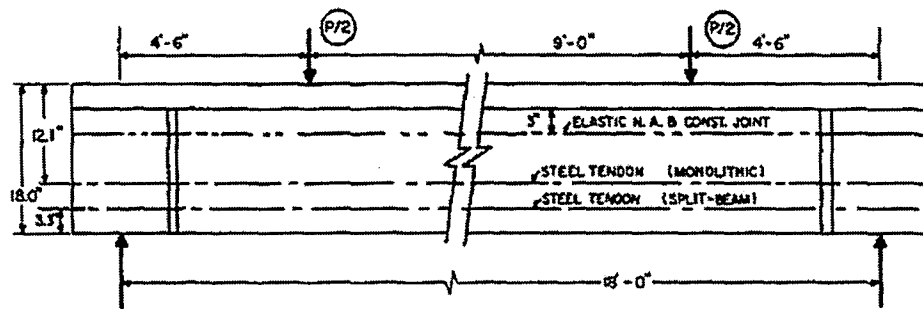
Elevation View of Loading Setup for the Split-Beam Tests
